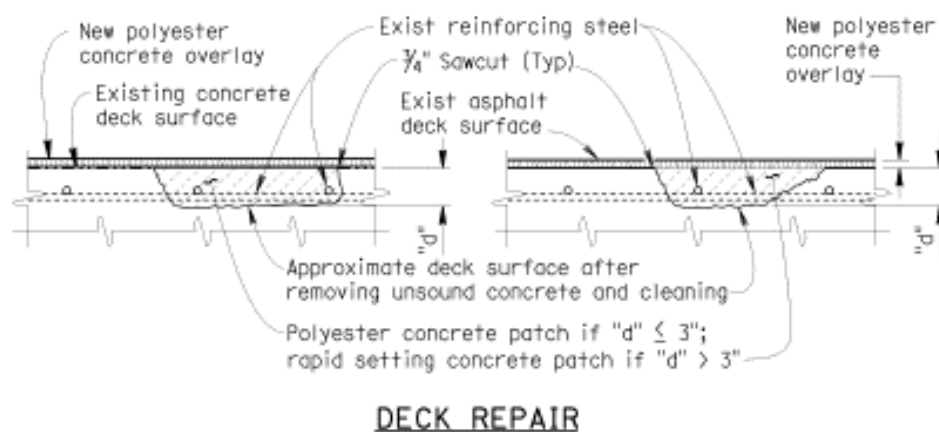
Sample Plan Sheet Permitting Polyester Concrete for both Patching and Overlay
